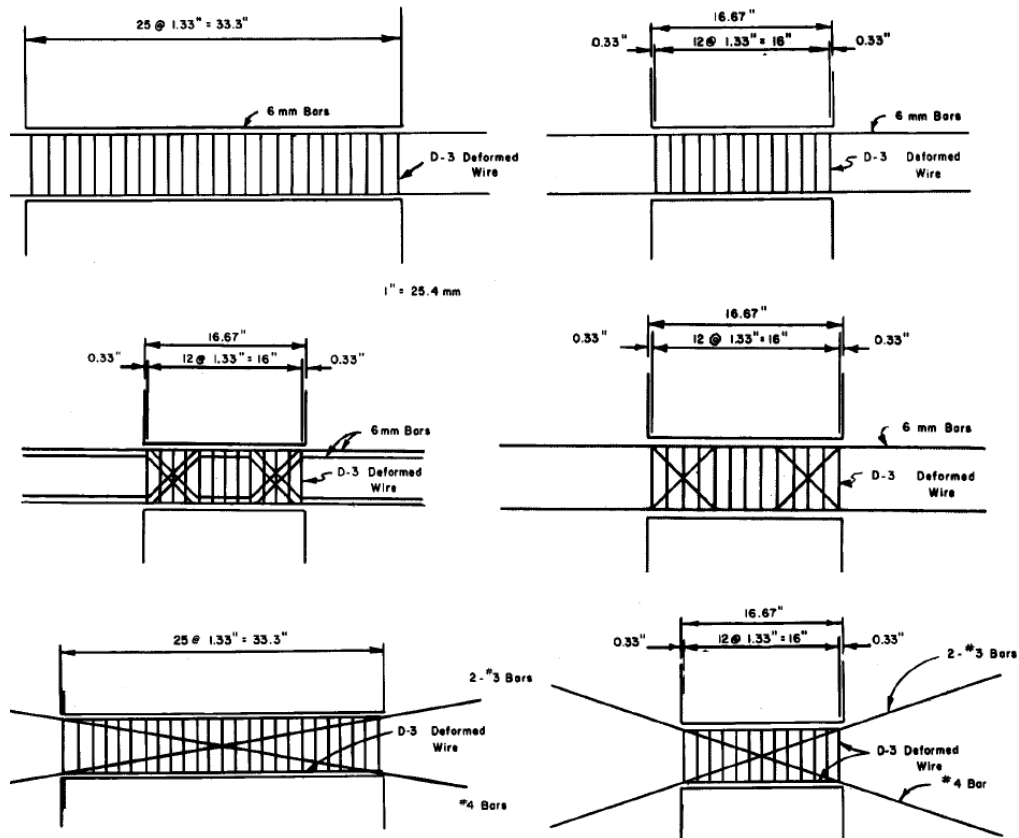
The reinforcement details for coupling beams (Shiu et al., 1978)
